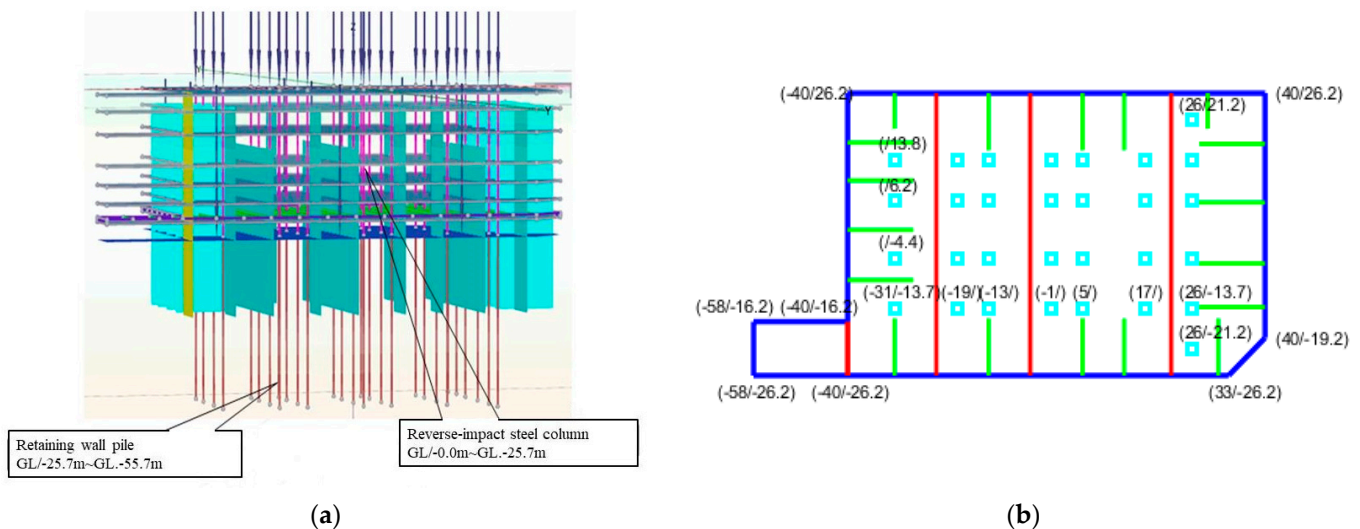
(a) PLAXIS 3D configuration of Pile Wall and Top-Down Steel Columns; (b) Plan layout showing positions of the Pile Wall and Top-Down Steel Columns. (where, the blue line represents diaphragm wall, the green line represents buttress wall, and the red line represents cross wall).
